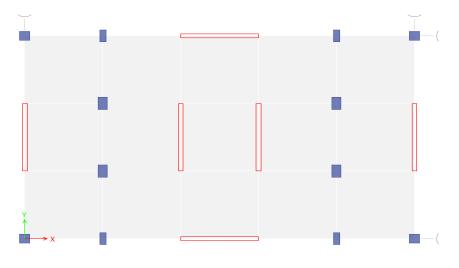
Plan view of Flat plate model with Shear wall in ETABS
